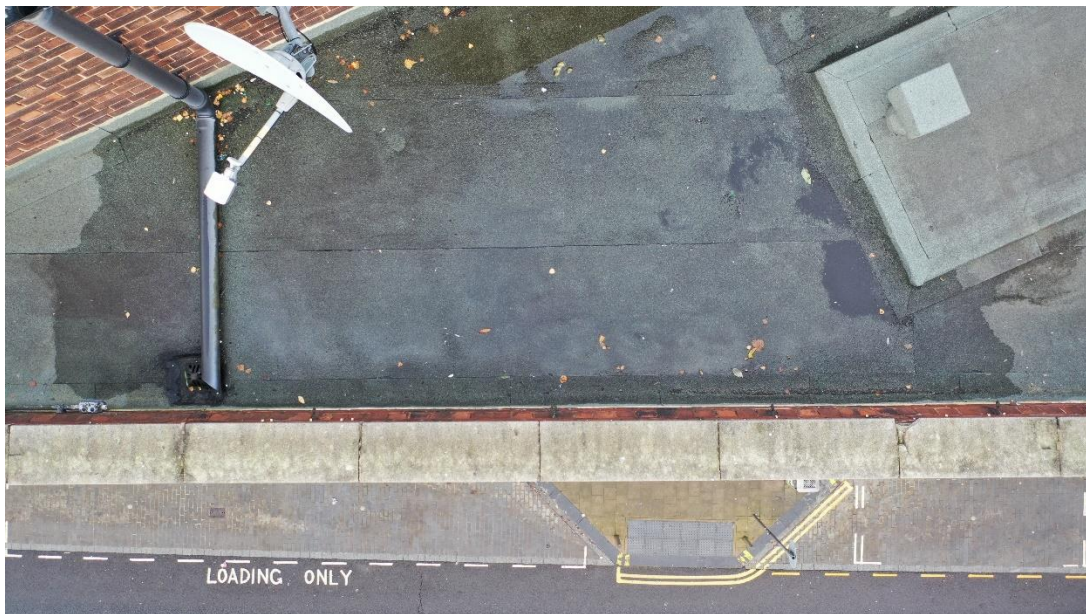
The triangular area of flat roof finished with green bitumen-based roofing felt
